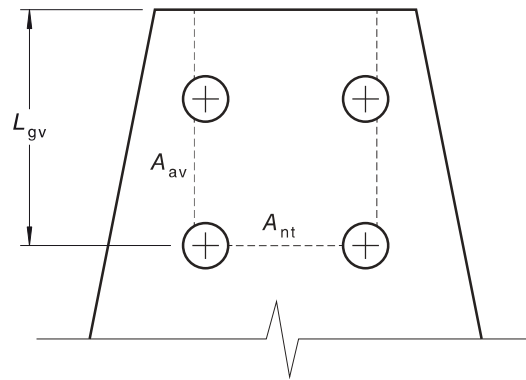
BLOCK SHEAR FAILURE PLANES
